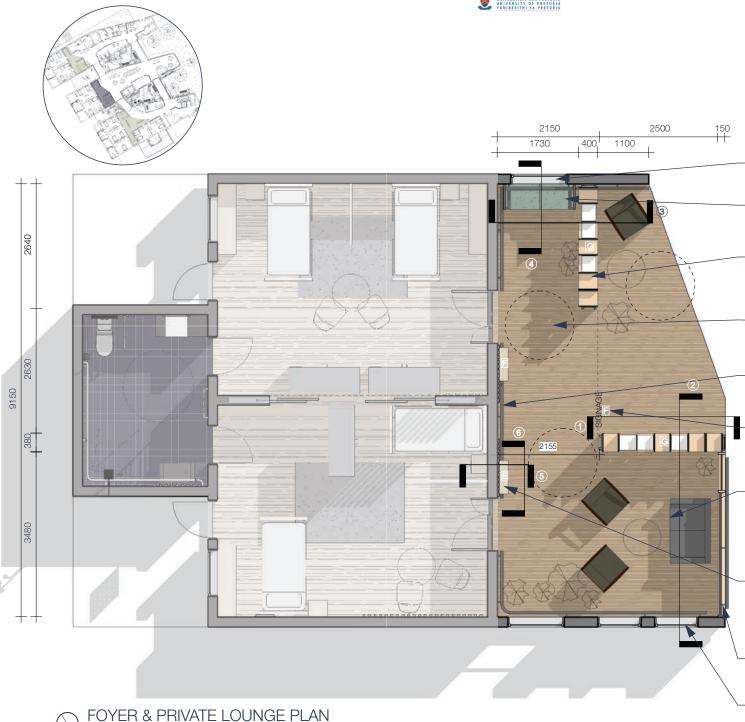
(Below) Floor plan of Foyer & Private Lounge (Author 2018)
